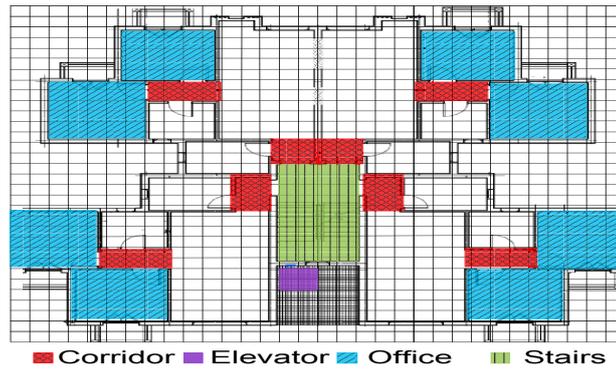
The floorplan used in our evaluation divided into blocks. Note that the entire area is not highlighted for clarity.
